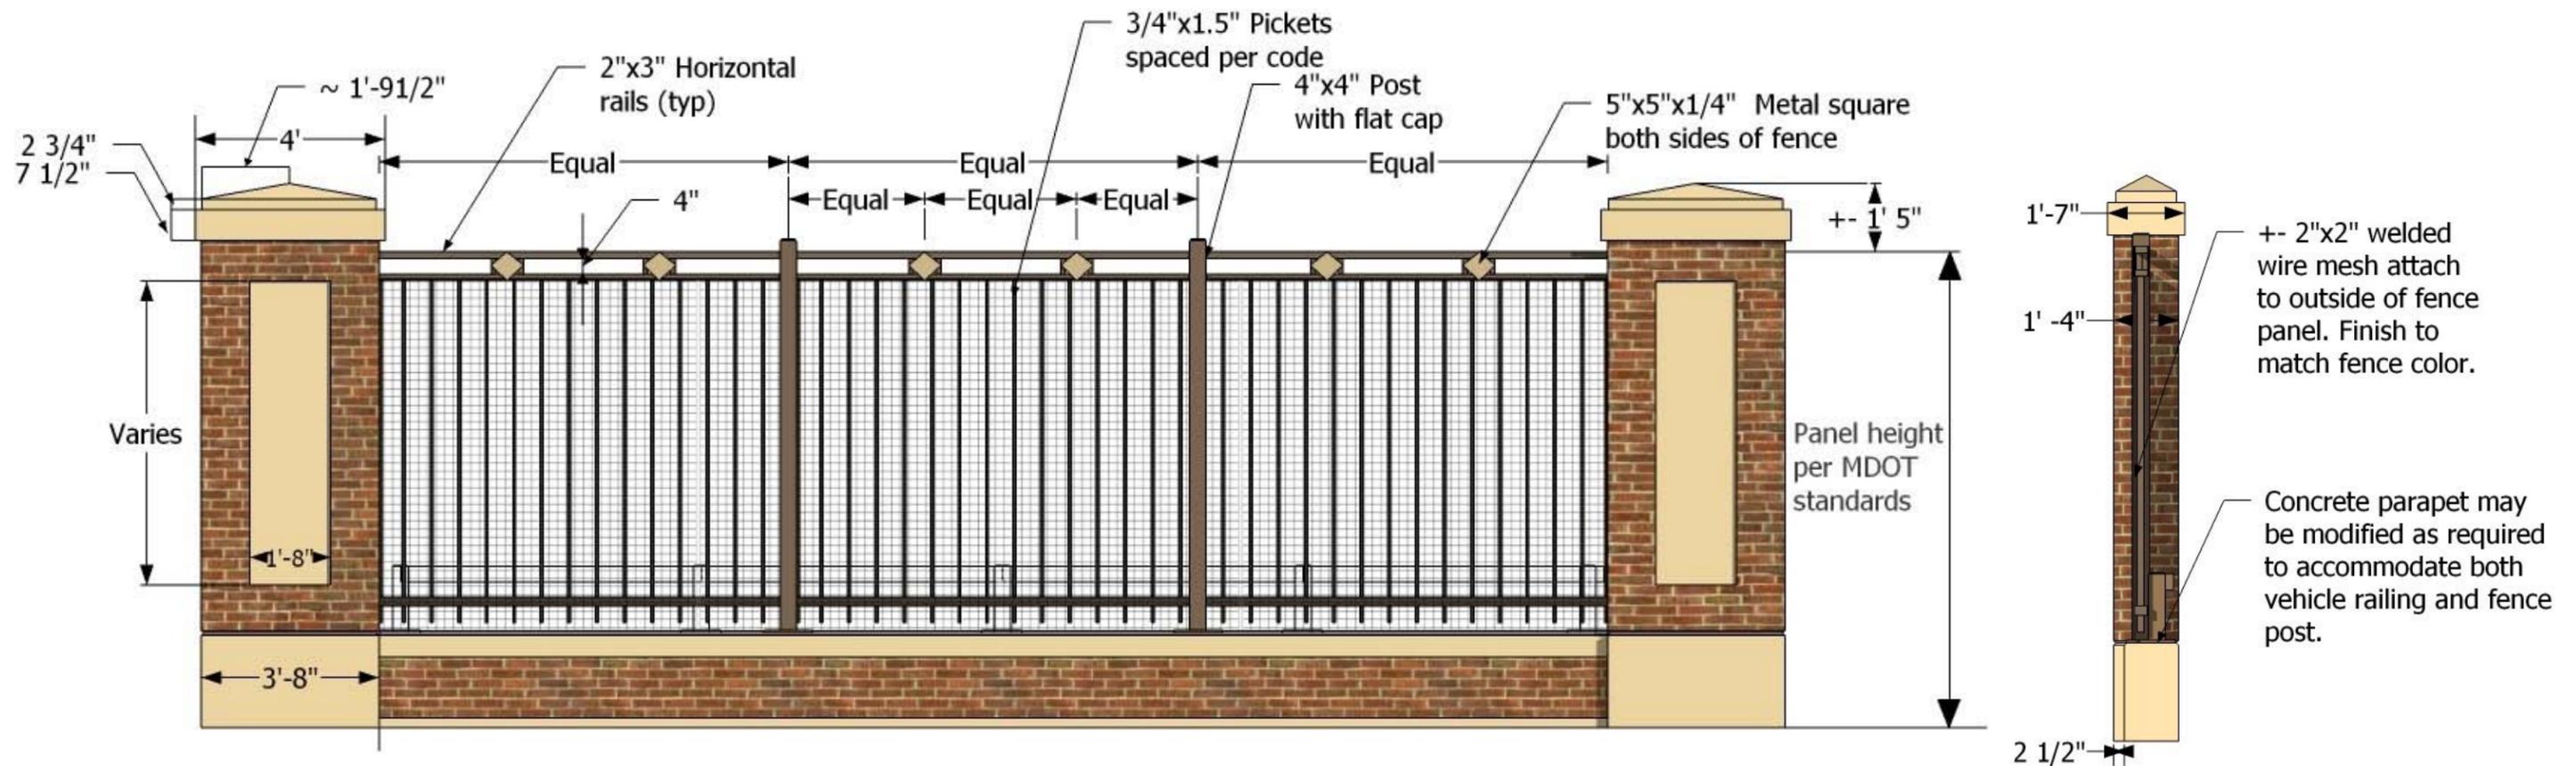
Elevation View of Pedestrian Fence when used on a Pedestrian-Only Bridge
